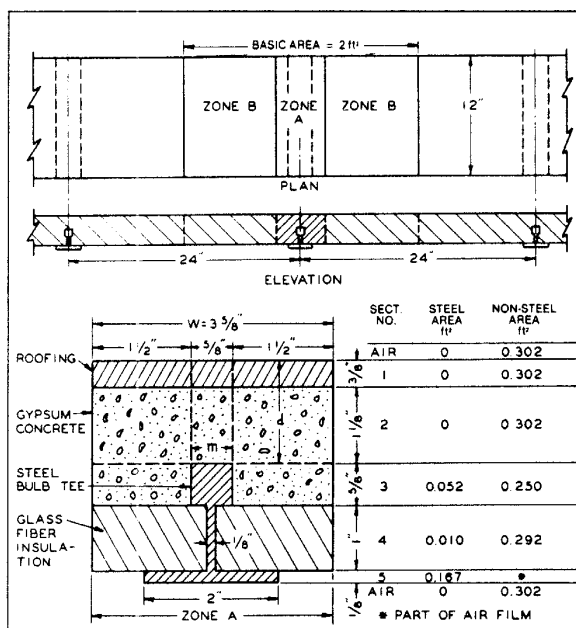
Gypsum Roof Deck on Bulb Tees (Example 4)
